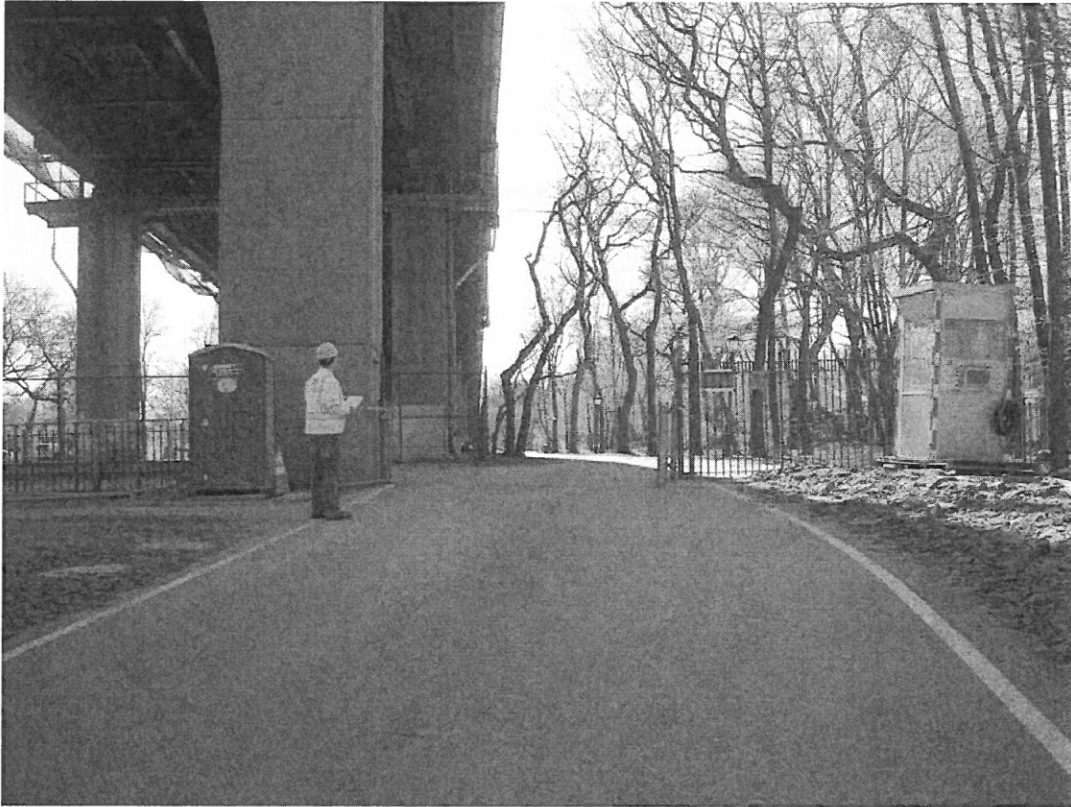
View southeast along the west side of the project area in vicinity of proposed Pier 2Q.
